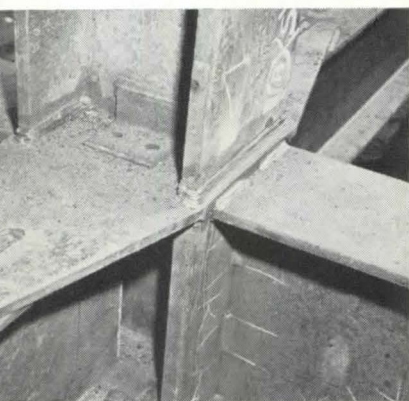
detail (left) of welded connection for columns and girders in field-welded steel frame of Robinson's Beverly Hills store.
